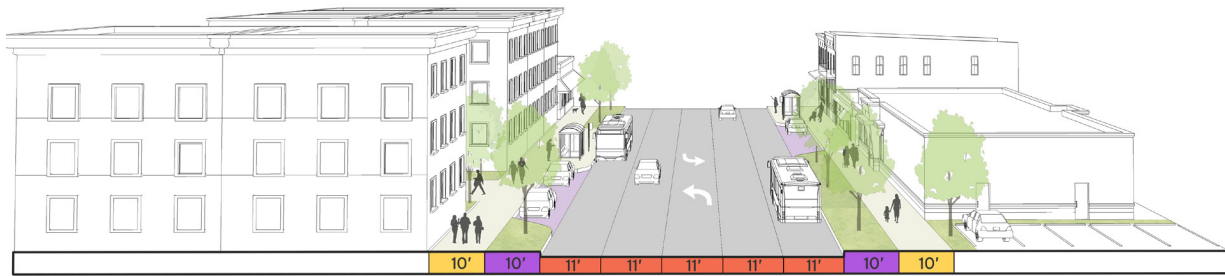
TYPICAL EXISTING SECTION WITH ON-STREET PARKING AND TWO-WAY LEFT TURN LANE
